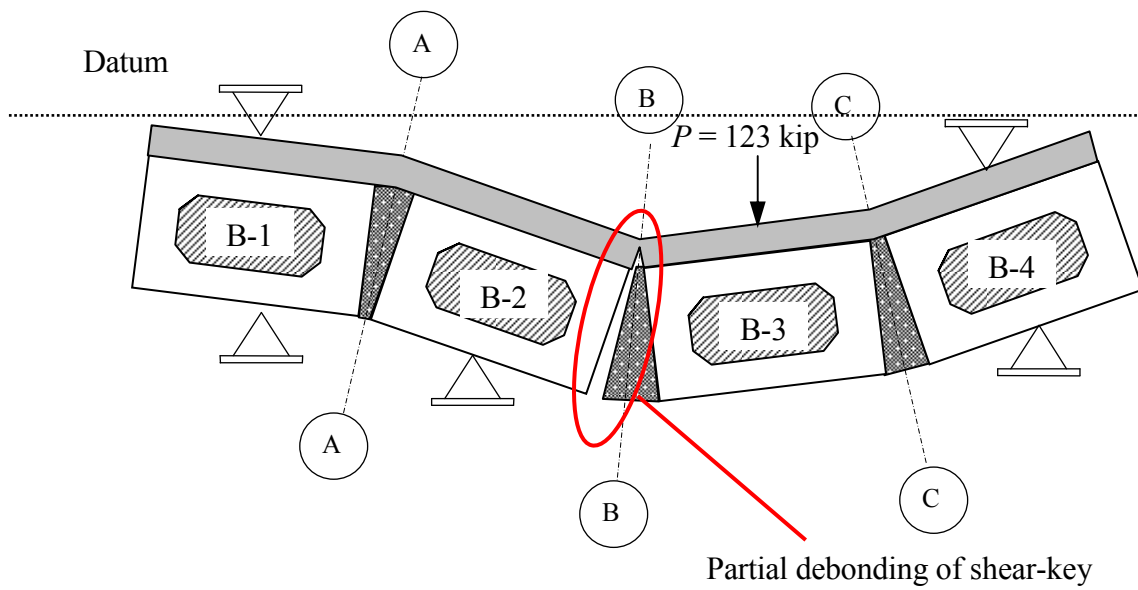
Bridge deformed shape due to applying vertical load at beam B-4.
